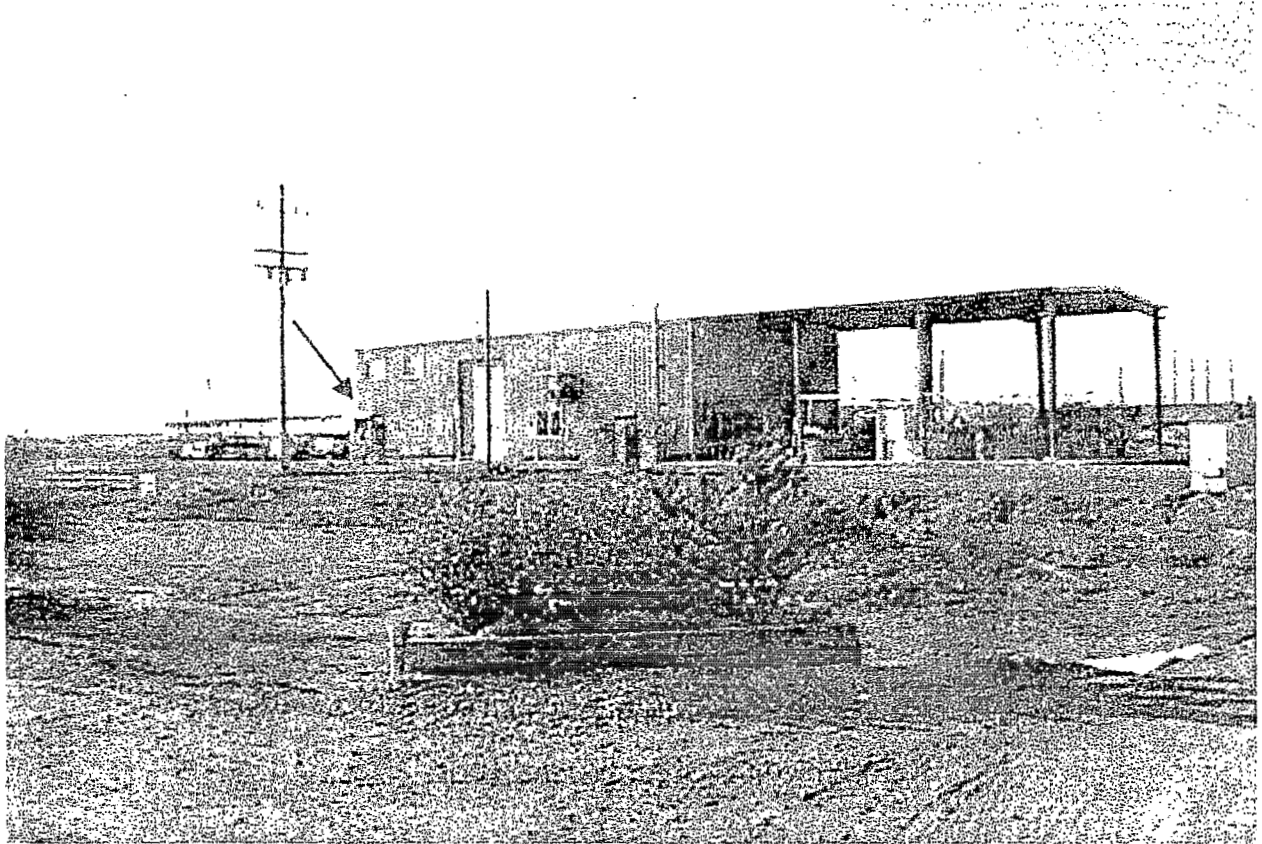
Picture of Biological Center building, located on southeast corner of El Centro Steam Plant's yard. Red arrow points to entryway for laboratory.
